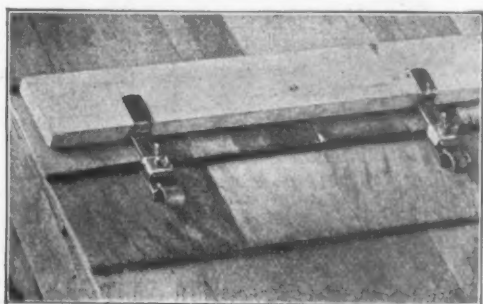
Shingle Gauge in Connection with Straight Edge.
